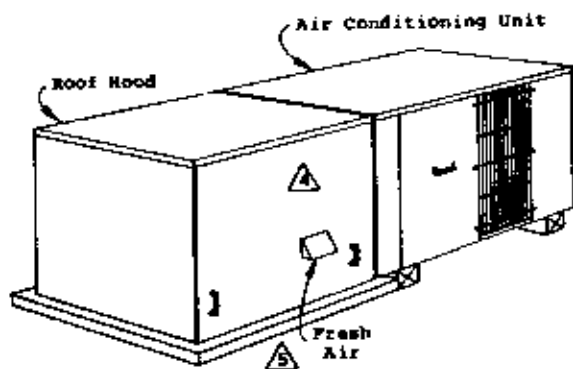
TYPICAL ROOFTOP INSTALLATION
